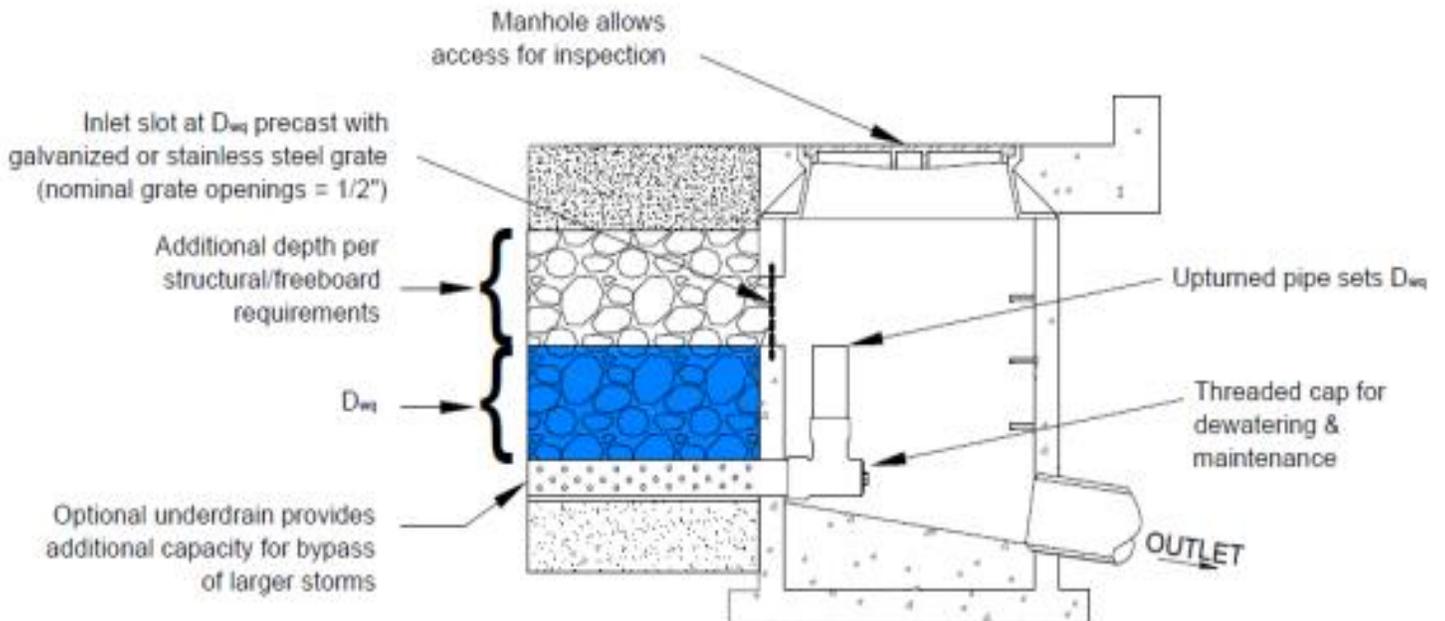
Permeable Pavement Example: Outlet for Infiltration System (NCSU-BAE)
